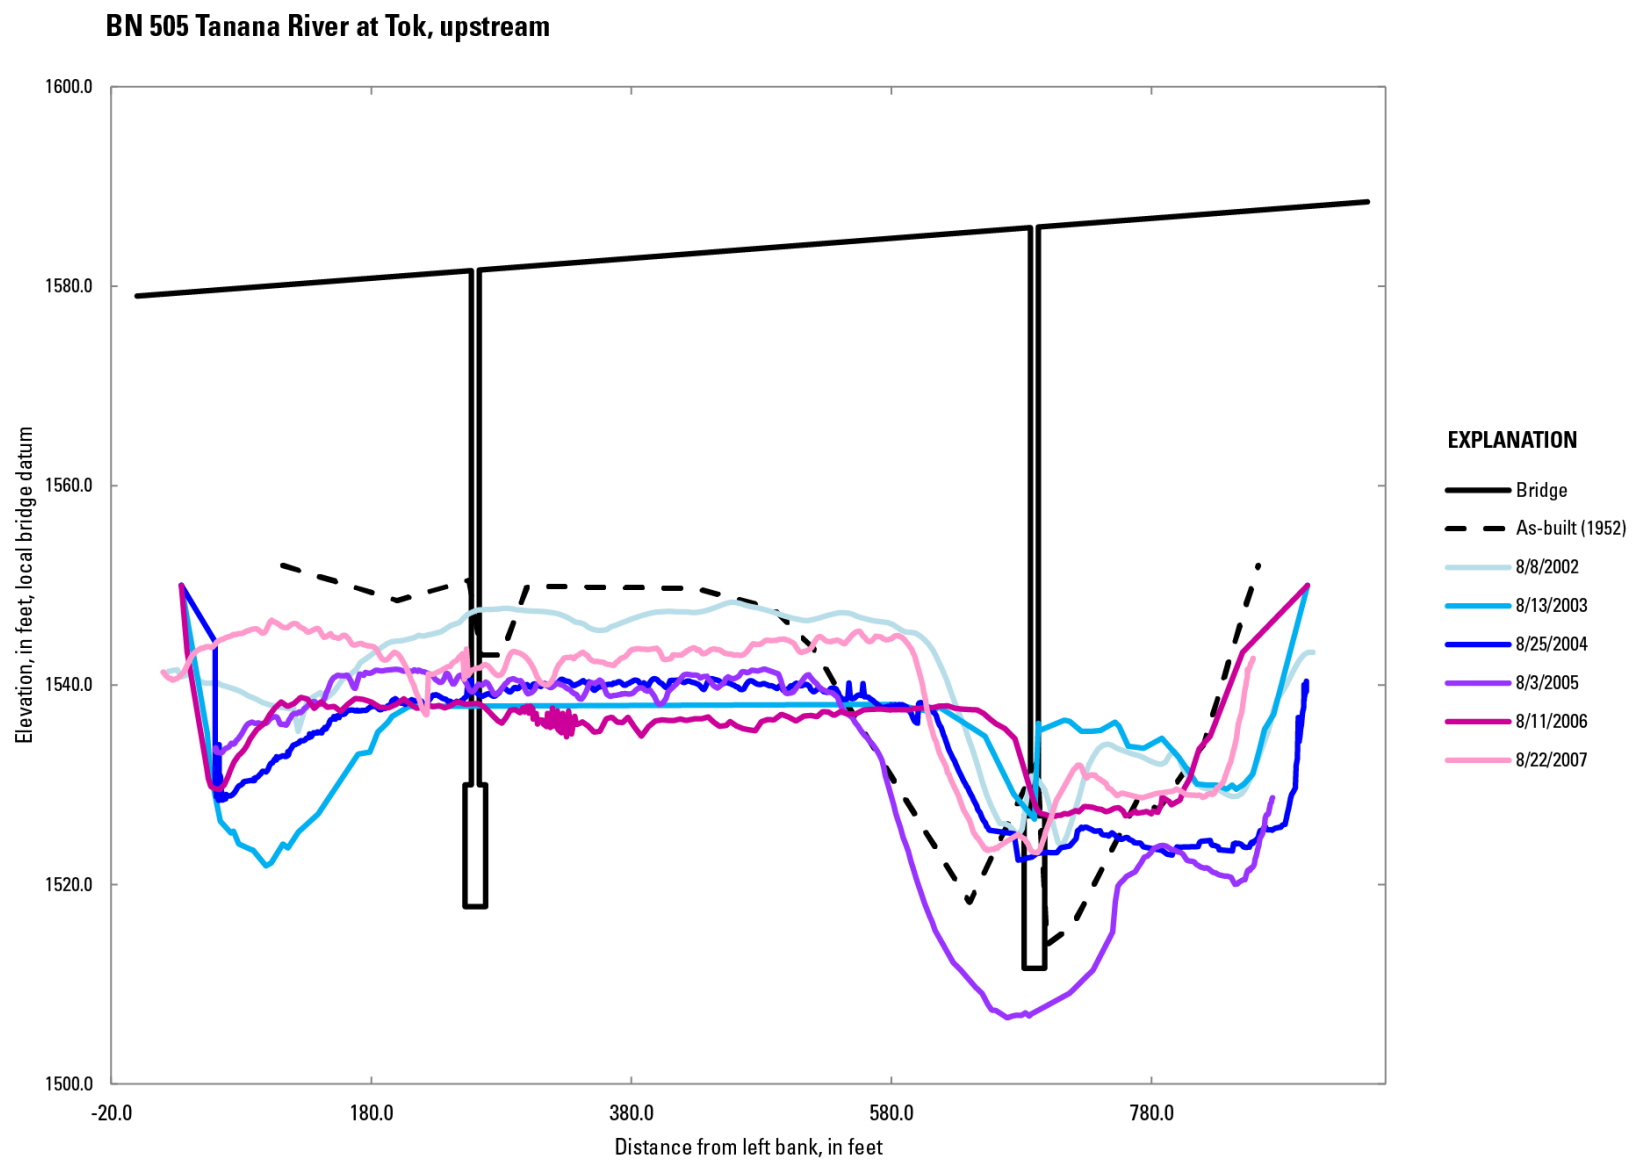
Cross sections showing upstream soundings at bridge 505, Tanana River at Tok, Alaska, 2002–07.
